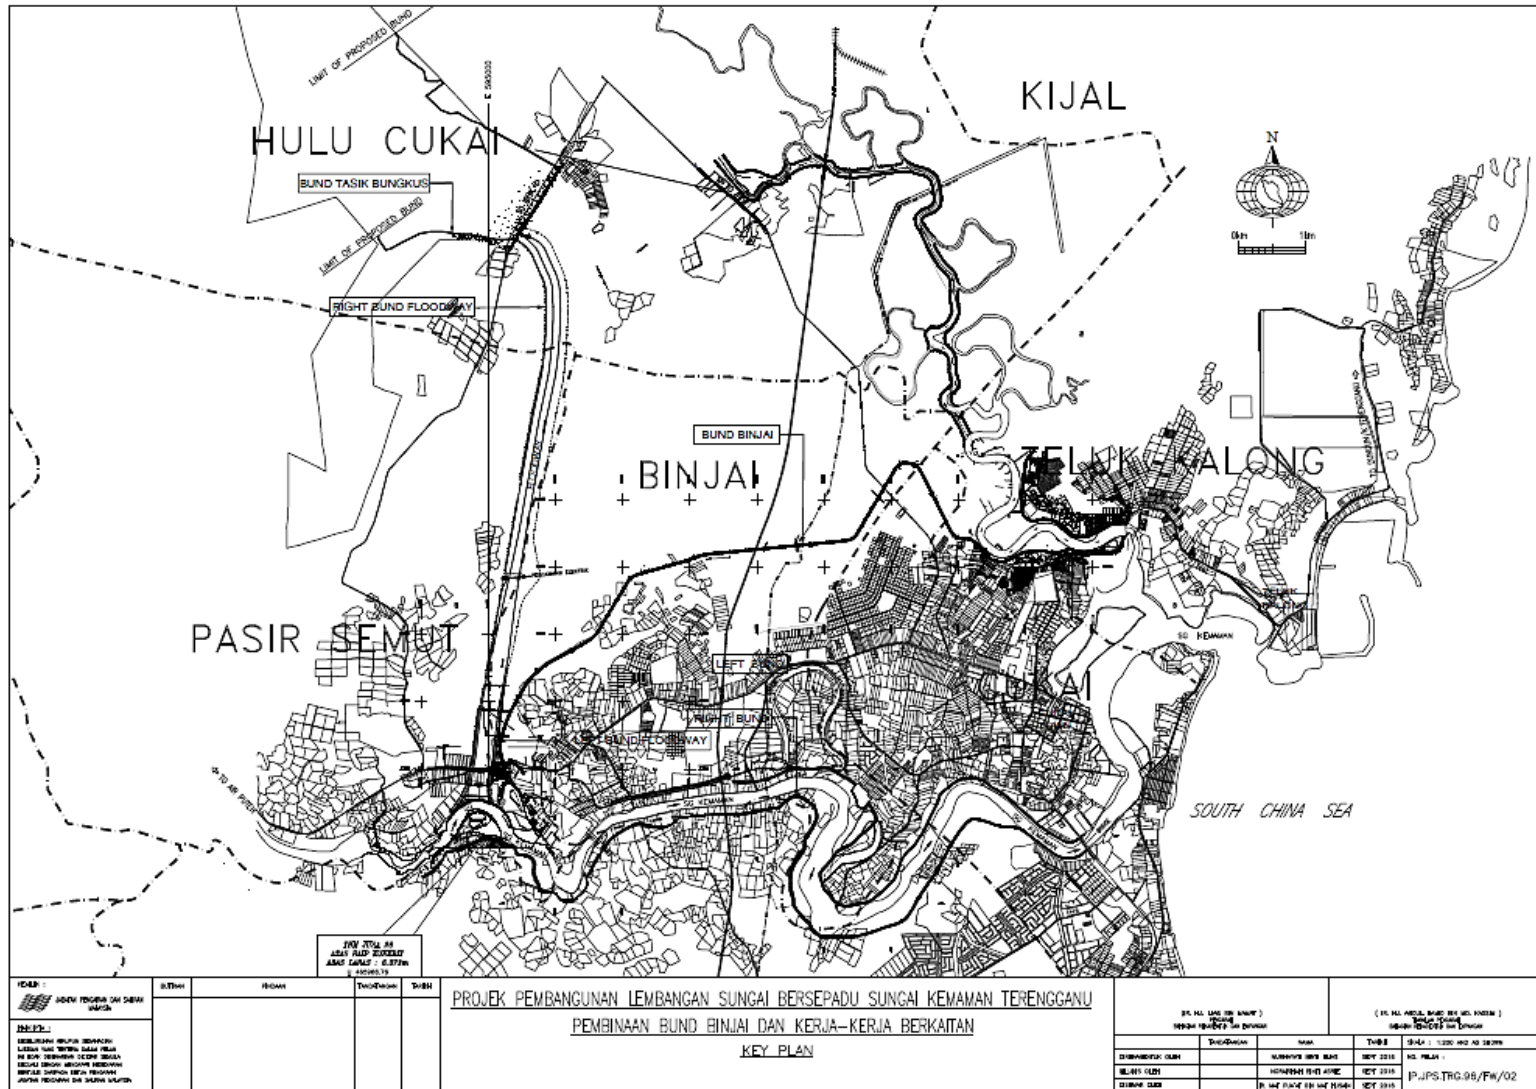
Project Key Plan. (Source: JPS, 2018)
